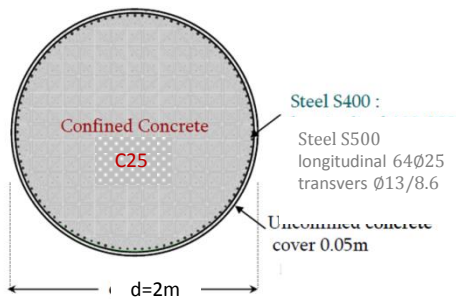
The geometric characteristics and the reinforcement of pier's section
